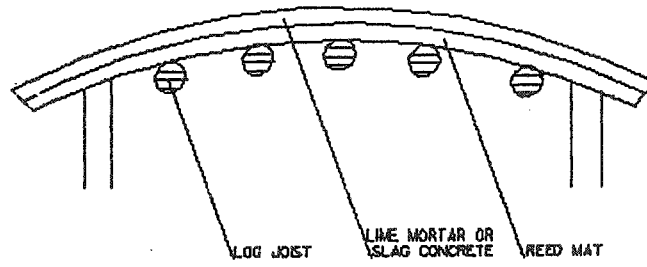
HENAN ROOF: VERTICAL PROFILE
